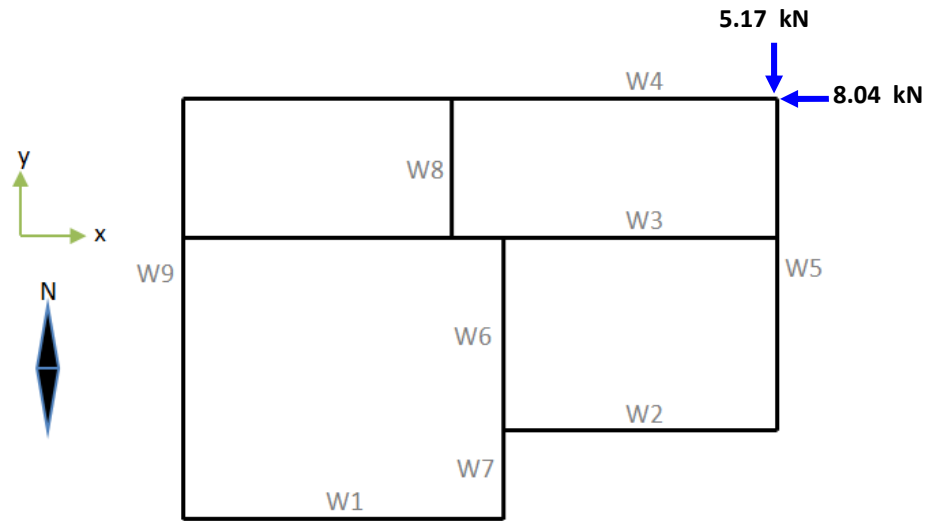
Load Case 9 – 8.04 kN Applied to Top-Plate at Wall 4 and 5.17 kN Applied to Top-Plate at Wall 5
